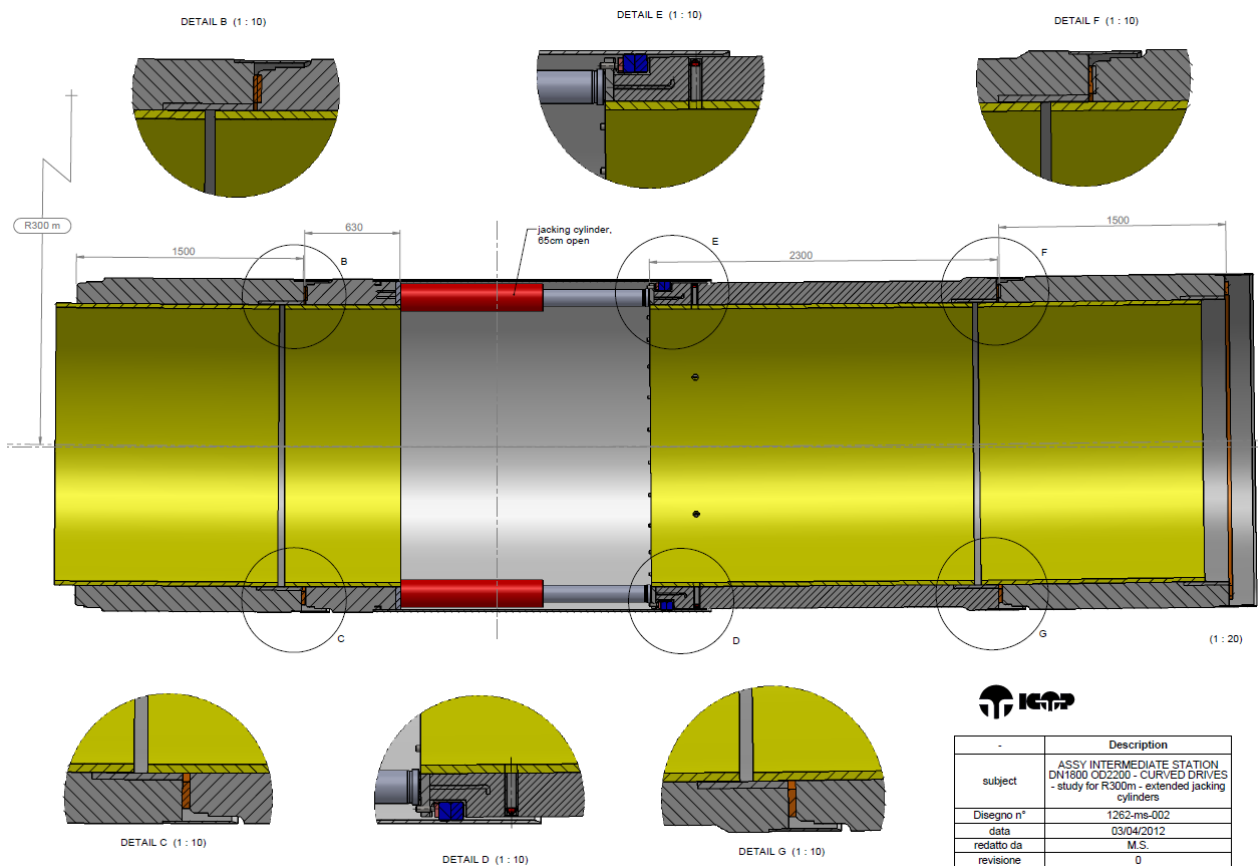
Detailed design of pipe connections, length, concrete properties, GRP thickness, sealing system, collars, pressure transfer rings and etc.
